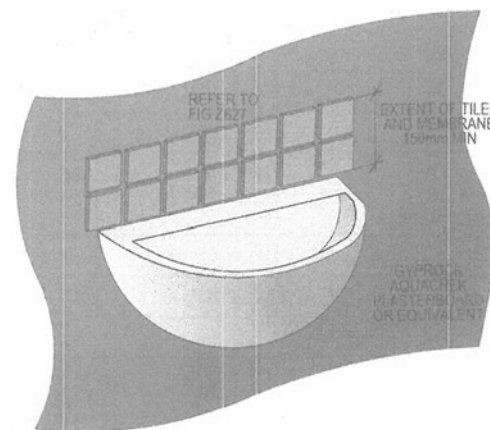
TYPICAL HAND BASIN - INSTALLATION DETAIL
